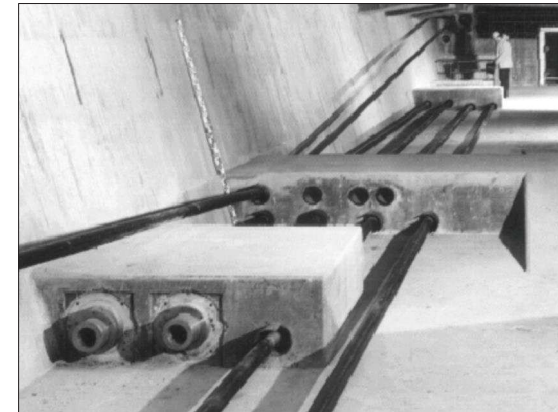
External prestressing tendons in a box-girder, deviation and anchor blocks along the span
